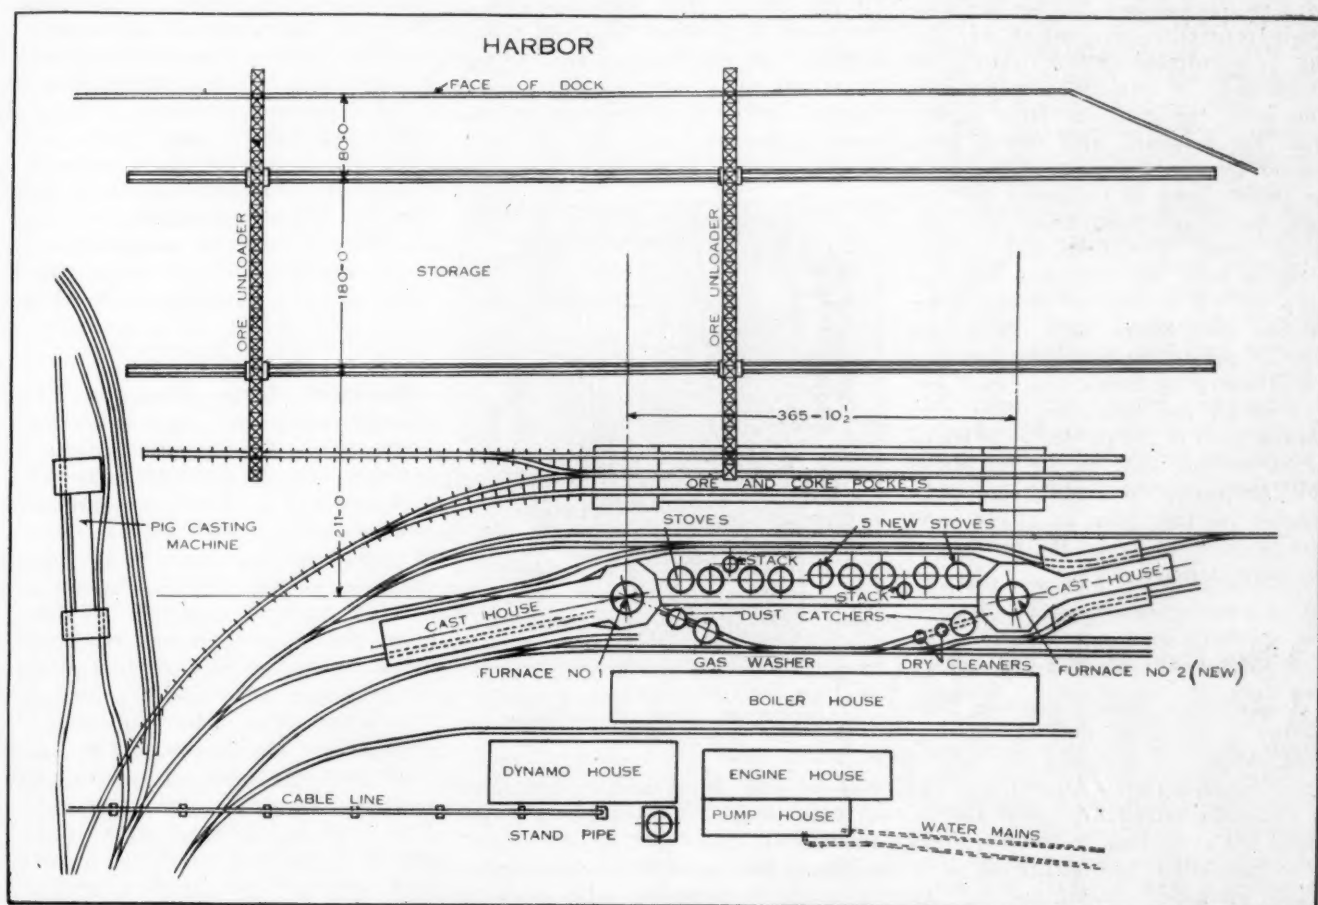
PLAN OF THE INLAND STEEL CO.'S BLAST FURNACE PLANT, SHOWING THE OLD AND NEW STACKS
